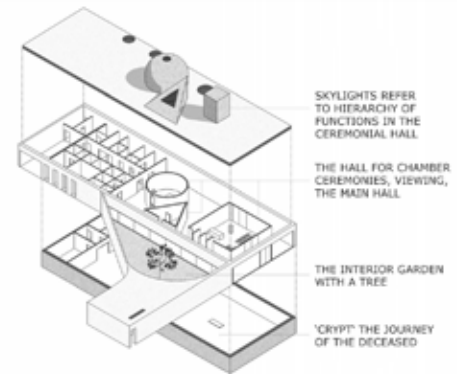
Layout solution of the new building of the mourning hall - Ondrej Vavro [3]
